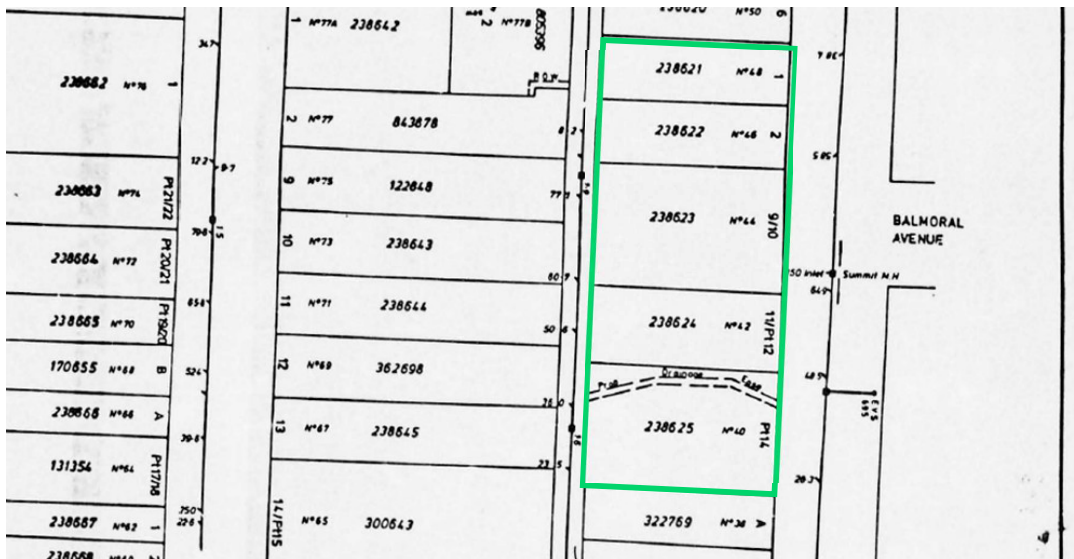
1982 Sydney Water plan showing the easement for drainage through no.40.
